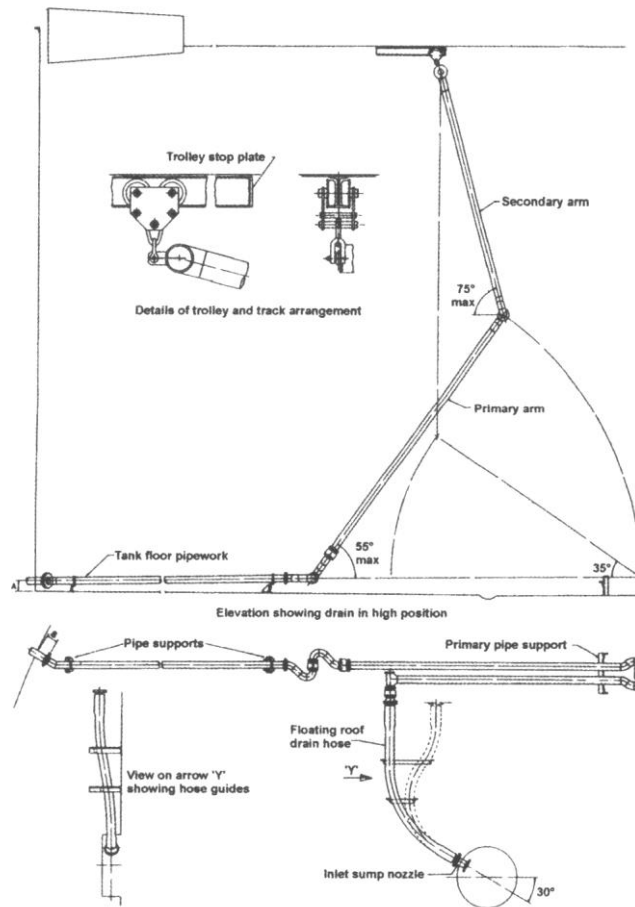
Articulated pipe drainage system for floating roof tanks
